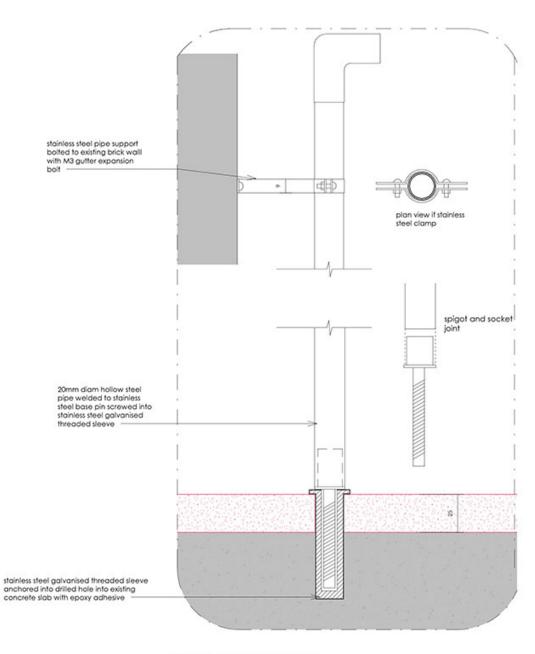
Details between existing structure and new floor finish - not to scale (Author 2013)
